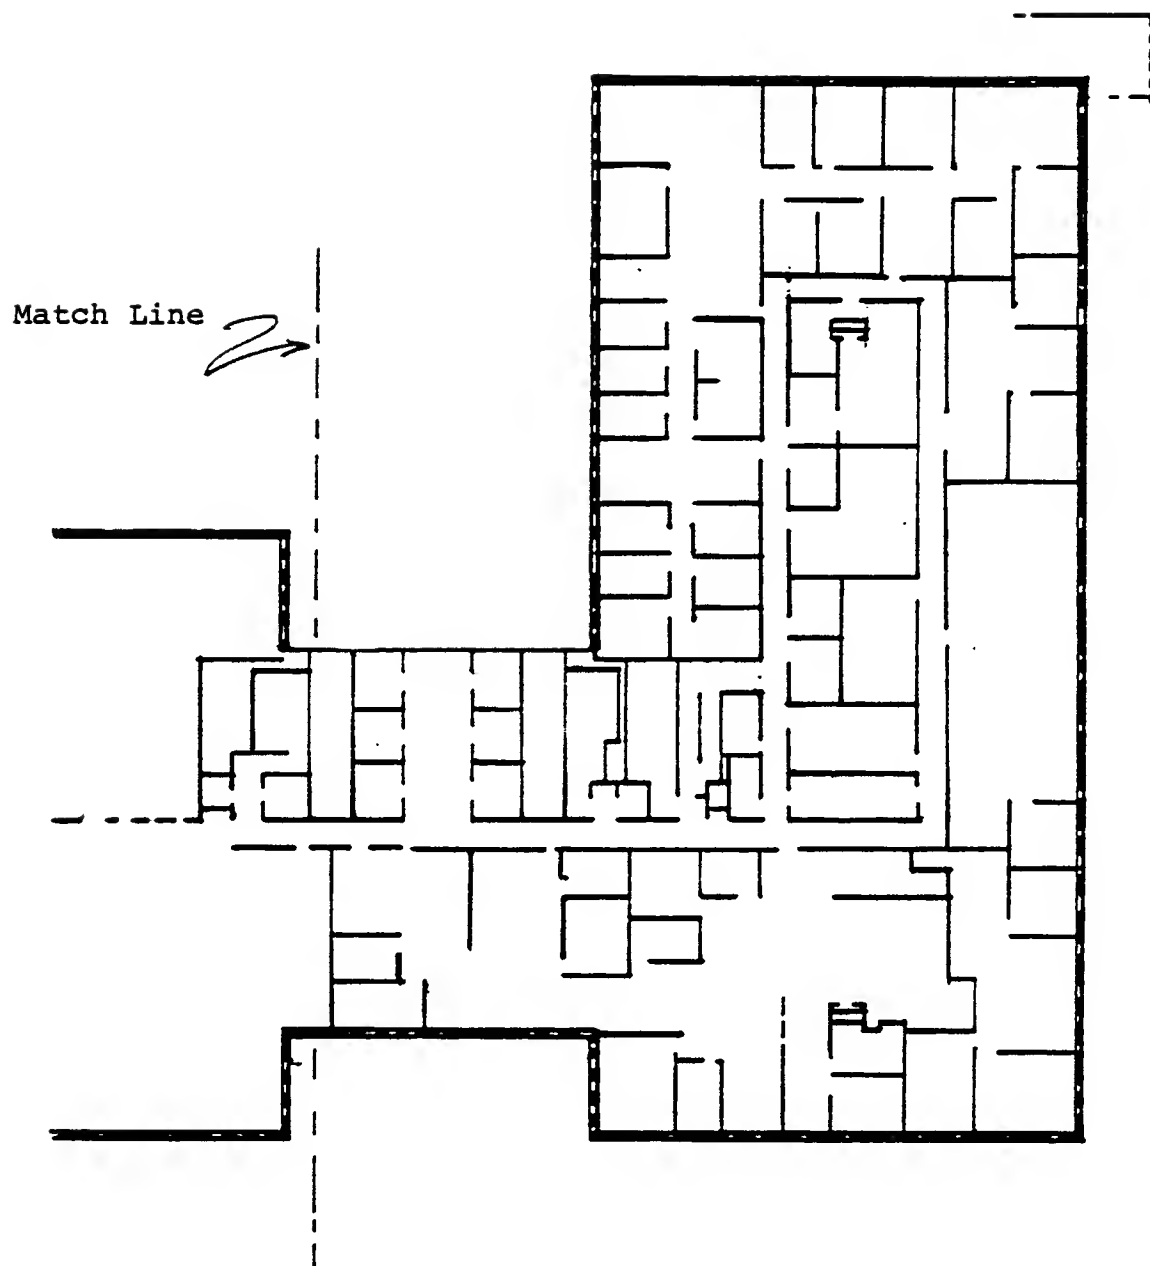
USIA BUILDING SECOND FLOOR-NORTH
